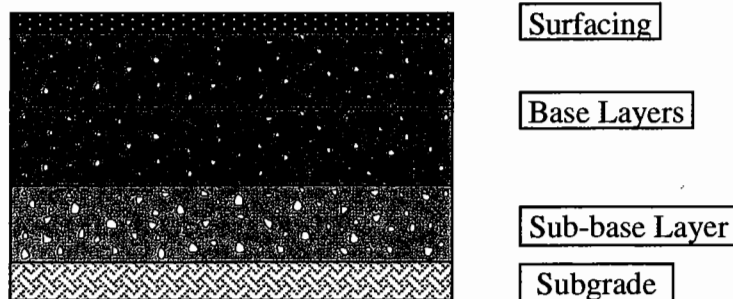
FLEXIBLE PAVEMENT IN AUSTRALIA
